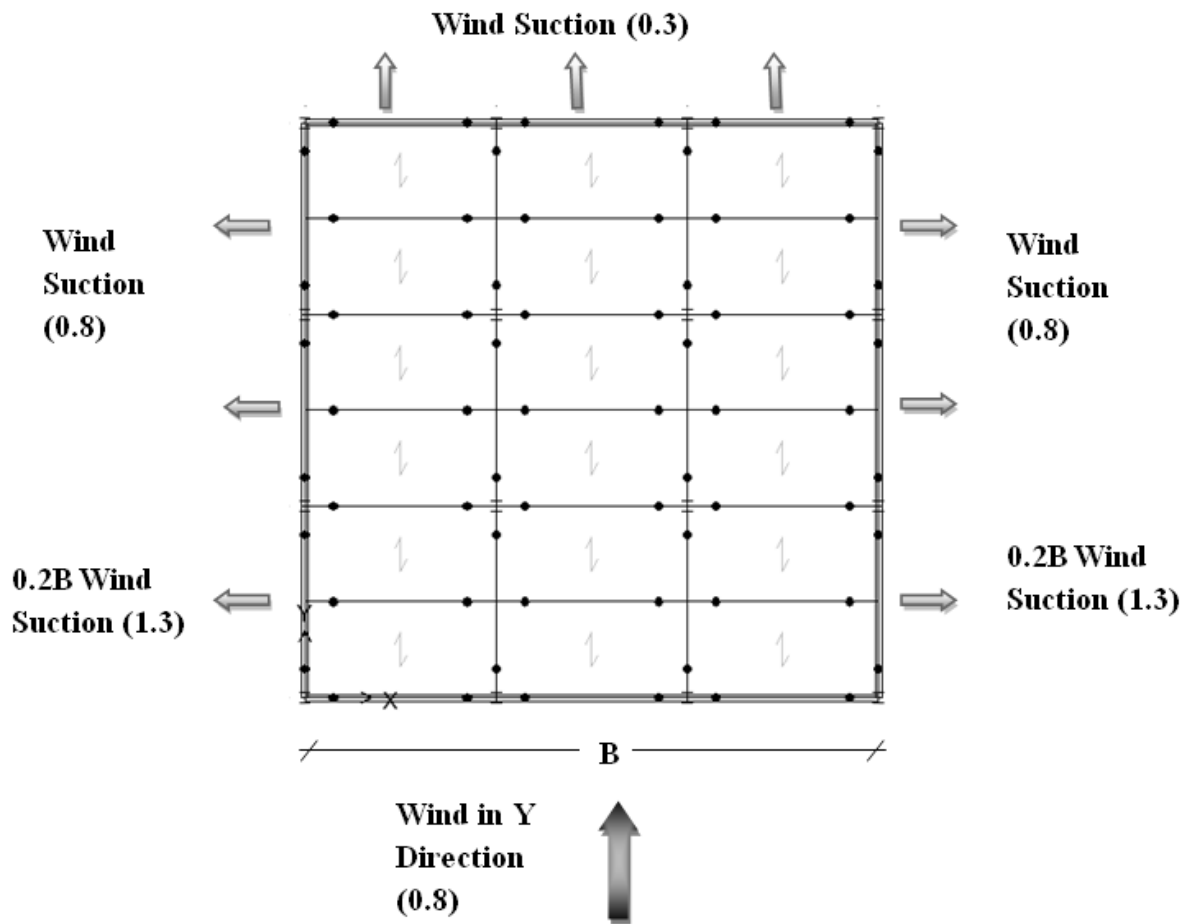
(b): Building plan layout indicating simple frame with pinned connections with wind in Y direction with suctions for symmetrical plan and section [14].
